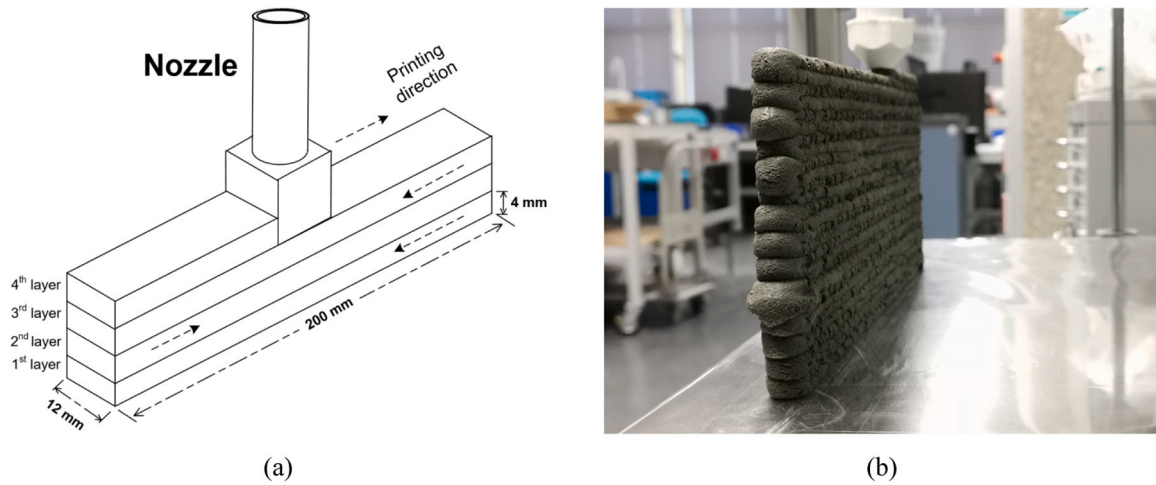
Wall structure for 3DCP (a) schematic diagram for designed wall structure (b) 3D printing test.
